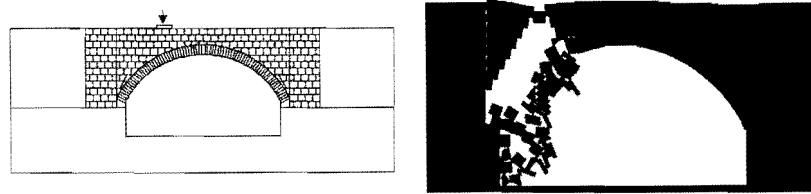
Finite element simulation of the collapsing bridge [13].
